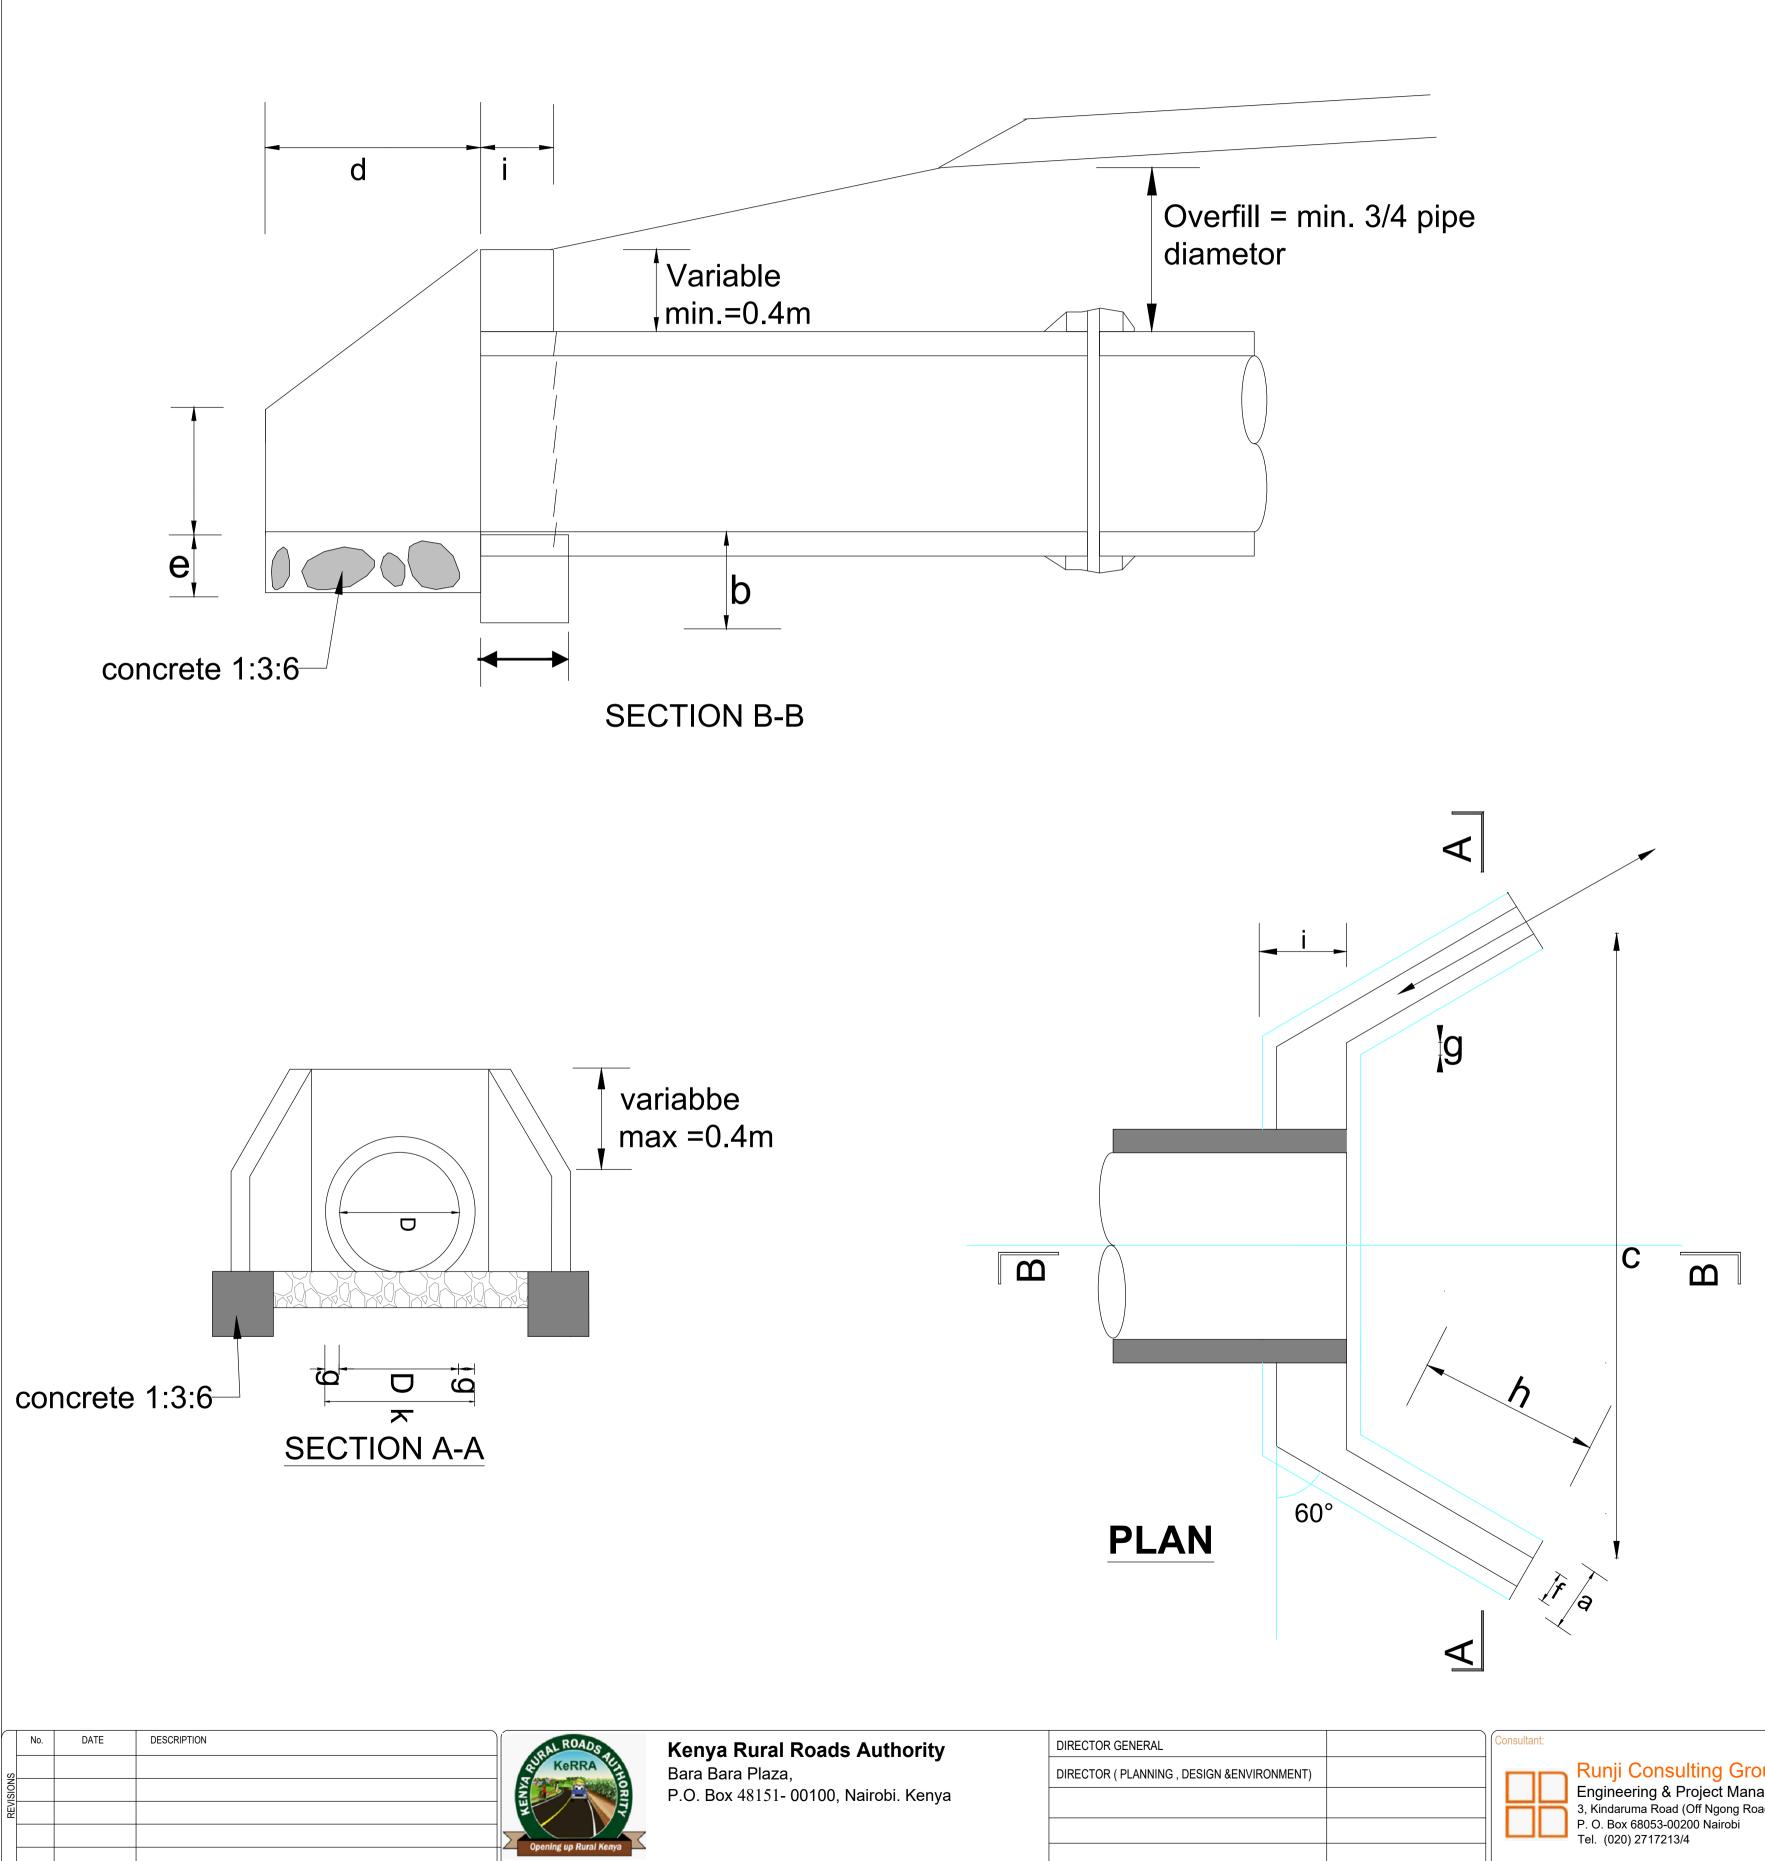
HEADWALL TYPE 4 (FOR ACCESS CULVERT)
